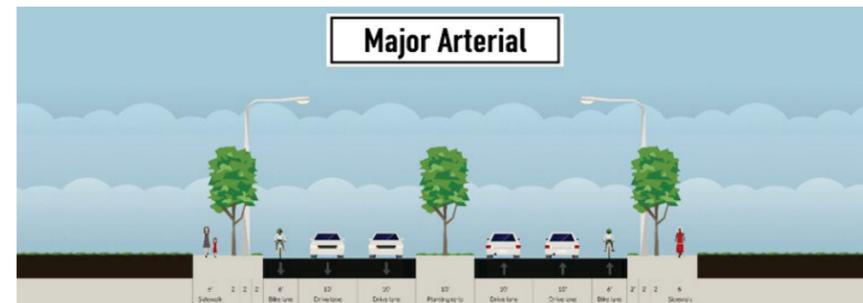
Medium Intensity Plan, Major Arterial Street; Source: Section generated from streetmix.net/
